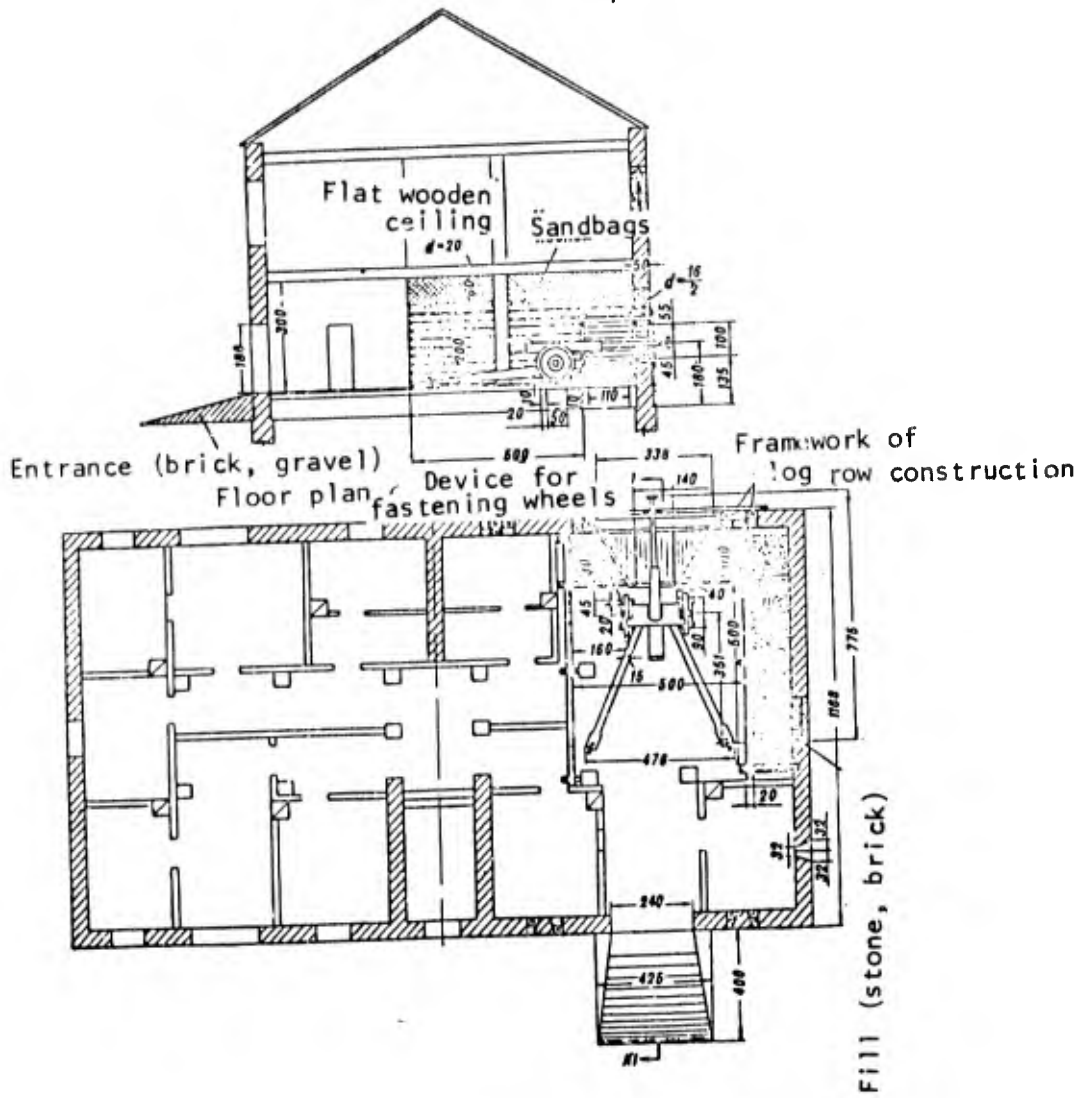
Building a Firing Position for an Antitank Gun in the First Floor of a Building.
